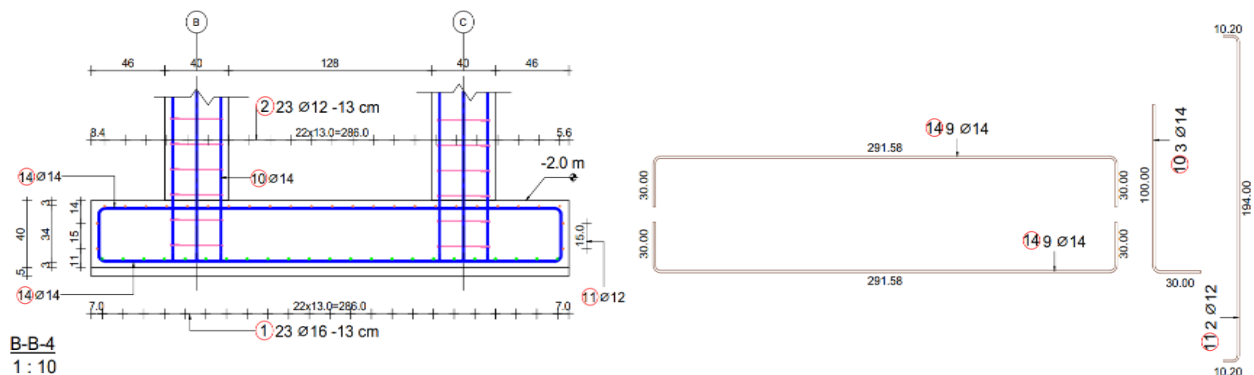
74. Longitudinal steel reinforcement plan of the combined footing
